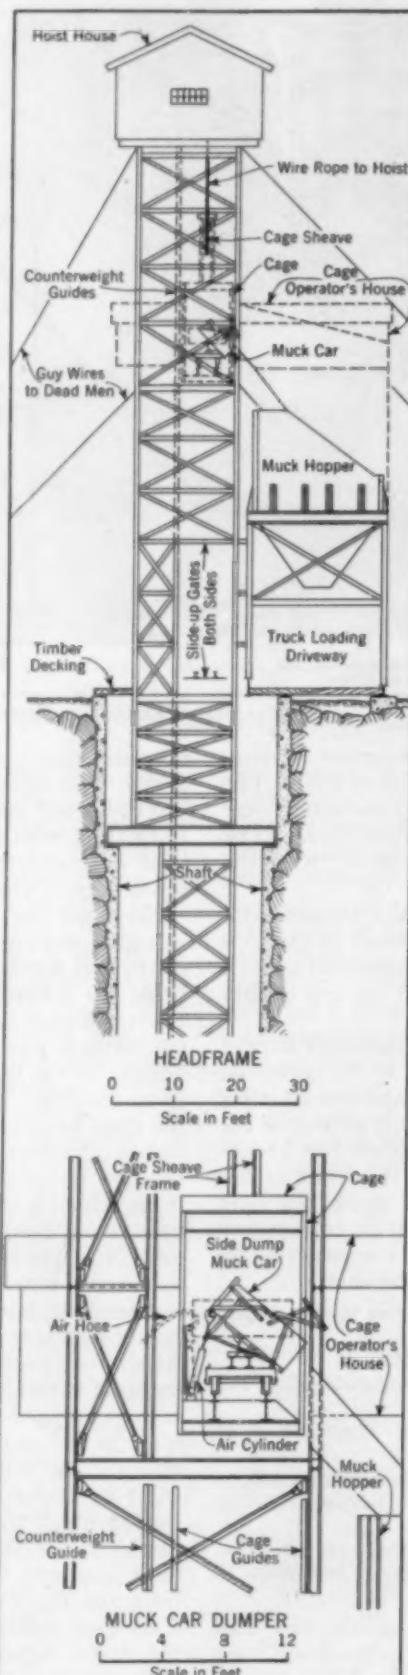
CROSS SECTION OF HEADFRAME AND MUCK-CAR DUMPER USED FOR TUNNEL CONSTRUCTION, AT SHAFTS 22 AND 23
